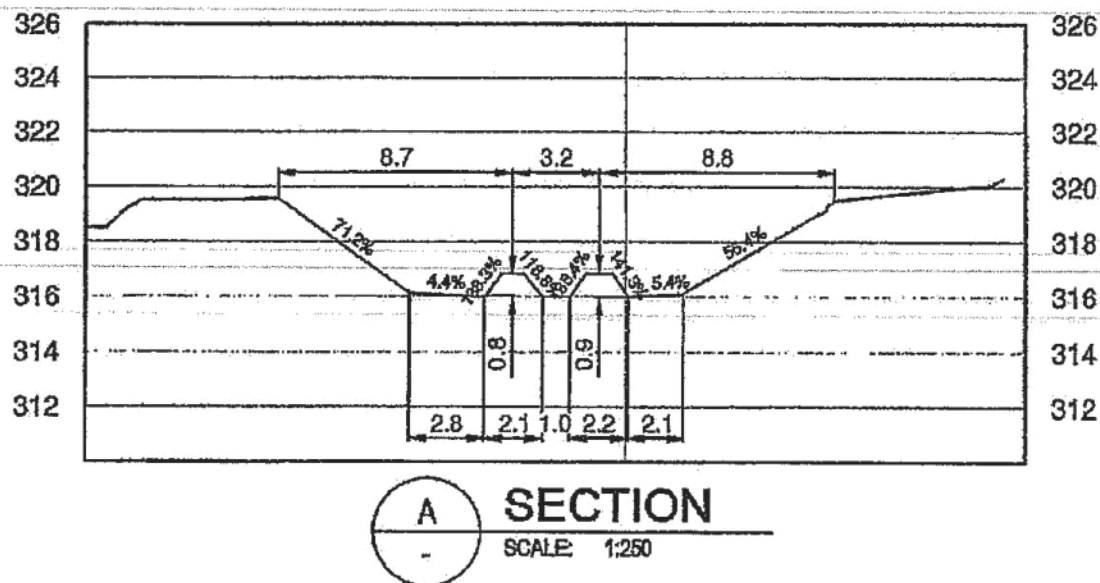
SETTLING POND CROSS SECTION FROM AS-BUILTS
